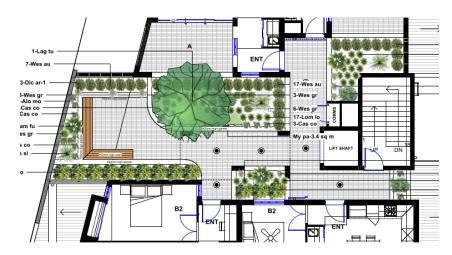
Extract of the proposed landscaping plan showing the communal open space.
